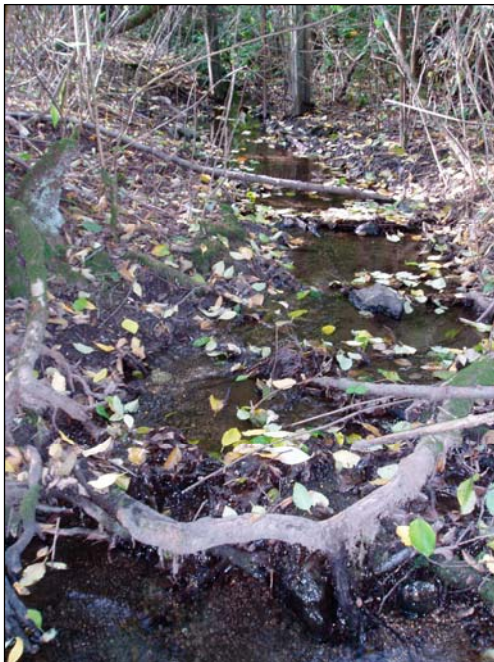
16th Avenue ditch draining east to stormwater drainage inlet.
